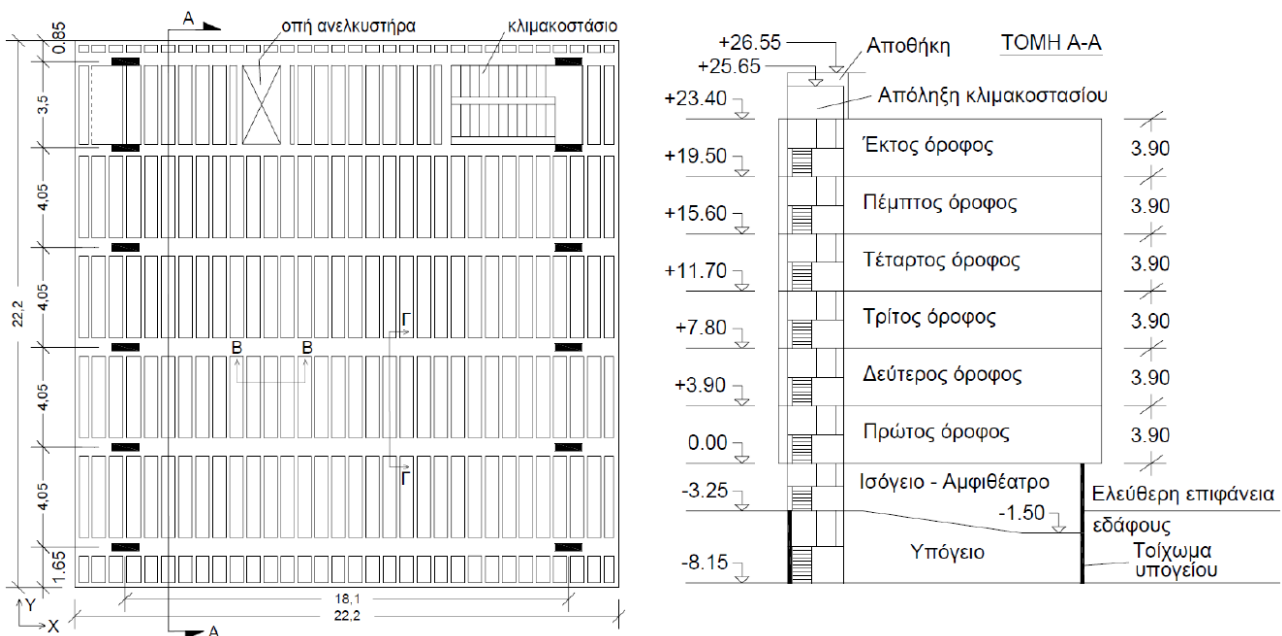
Typical plan and vertical cross-section of the existing building – Source: [111]
